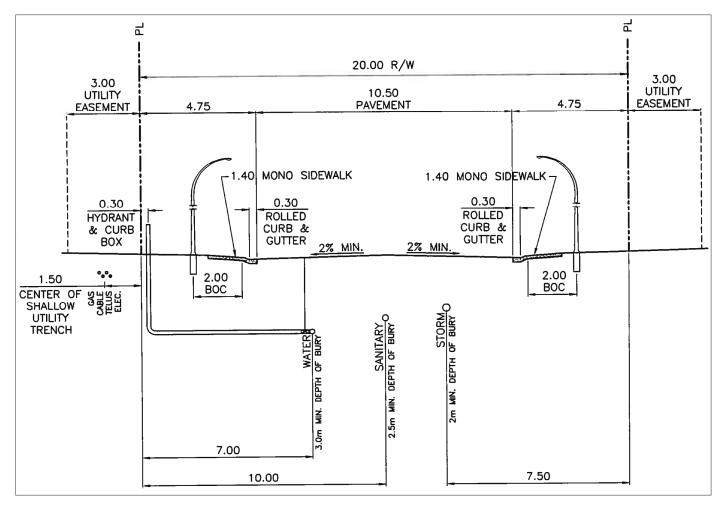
20m R/W Urban Local Street Cross Section (Drawing No. ST-1 from the Engineering and Development Standards)
